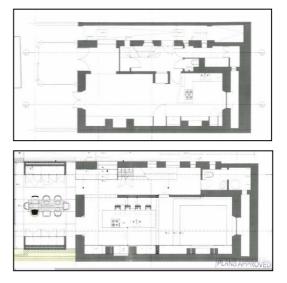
Existing and proposed basement plans at no.12 Provost Road.
